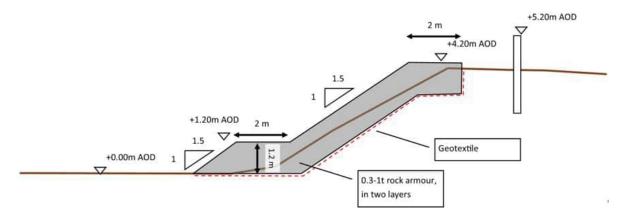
Typical cross-section steel sheet piled wall with capping beam/plate and rock armour revetment the revetment may be directly adjacent to the wall or separated with a gap depending on the local constraints
